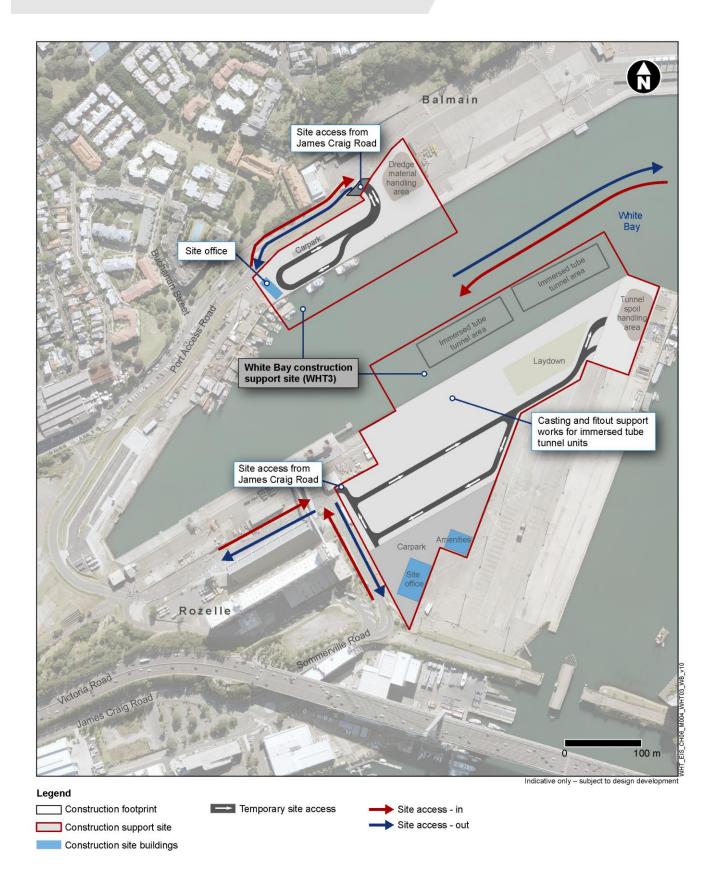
Indicative construction support site layout – WHT3 – White Bay
